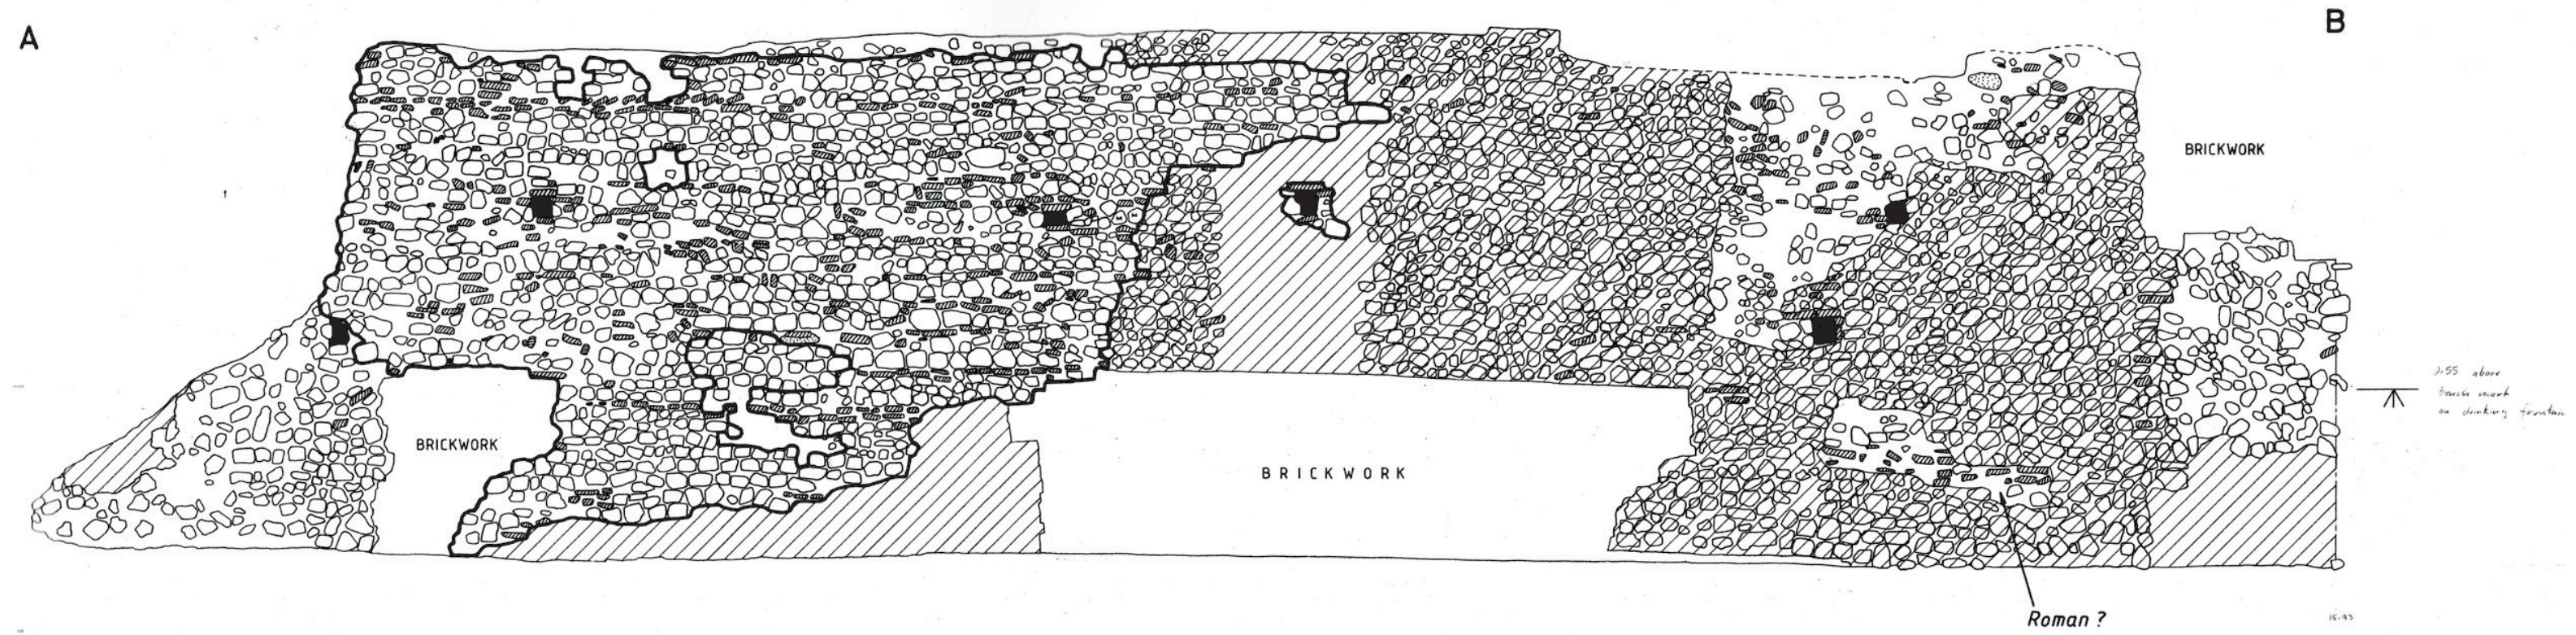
Northern elevation of Section 21 of the town wall. Phasing conventions taken from town wall elevations in 1980-90s (see Fig 6).
